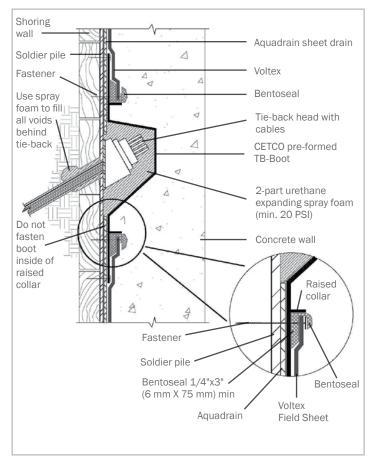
TIE-BACK DETAIL - Install TB-Boot centered over tie-back then install main course of Voltex with Bentoseal detailing. Do not fasten boot inside of raised collar around center formed area.
